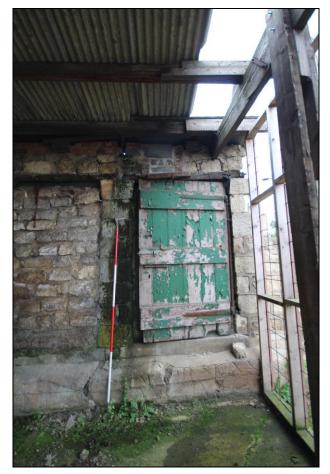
View of doorway along the west wall of building I, facing west, 2m scale.
